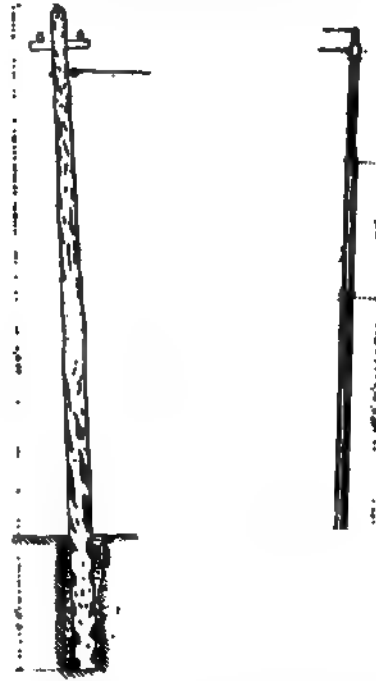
Method of Planting Wood Pole and Iron Pole.
